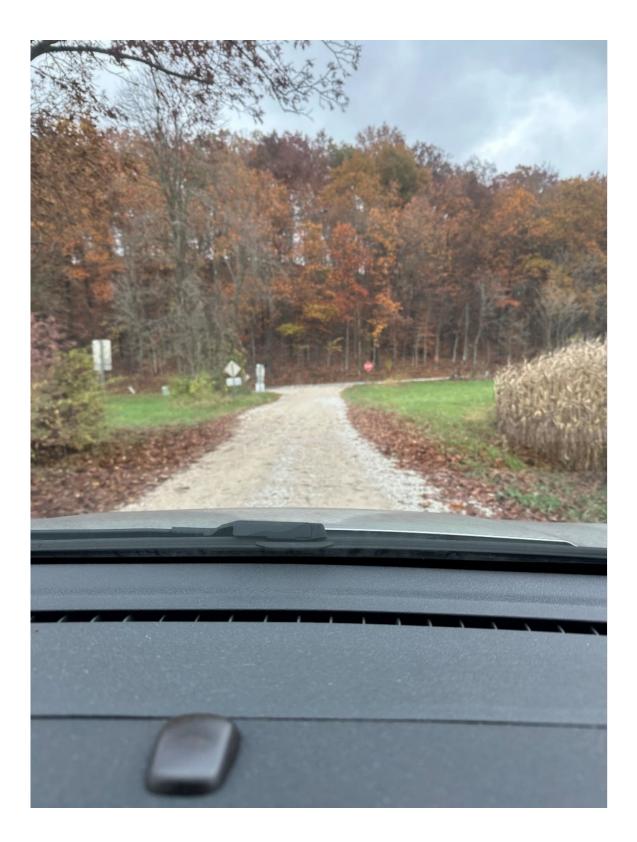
North-facing view of the intersection of N Maple Grove Road and N Bottom Road
